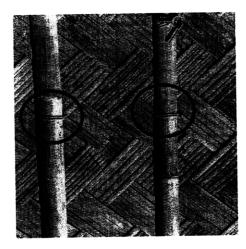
Typical Sawali - Bamboo connection with lashing 46
